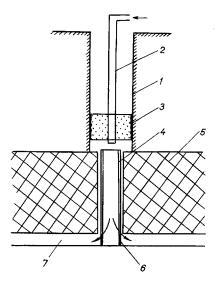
Grout injection method for old workings with overlying zone of intensive fracturing. l = borehole; 2 = drill pipes; 3 = packer; 4 = well casing; 5 = zone of intensive fracturing; 6 = perforation; 7 = old working.
